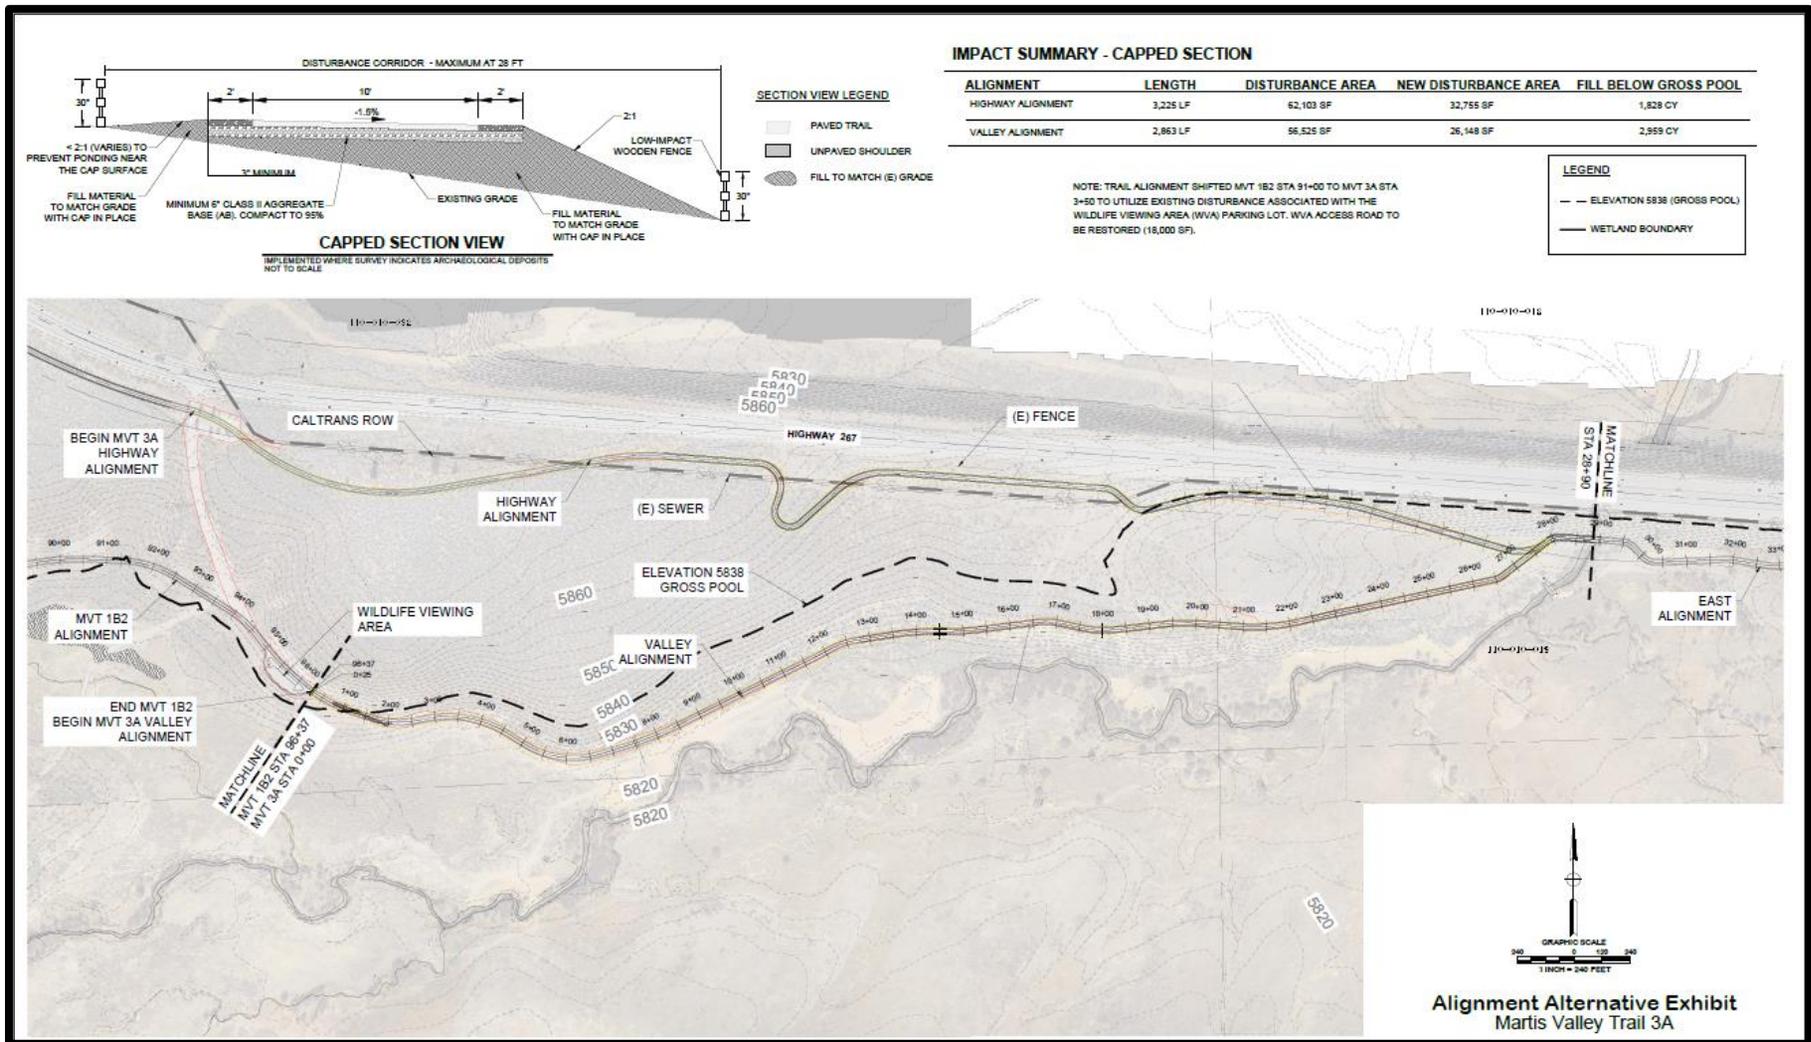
Proposed Design Refinements of Capped Section in Segment 3A.
